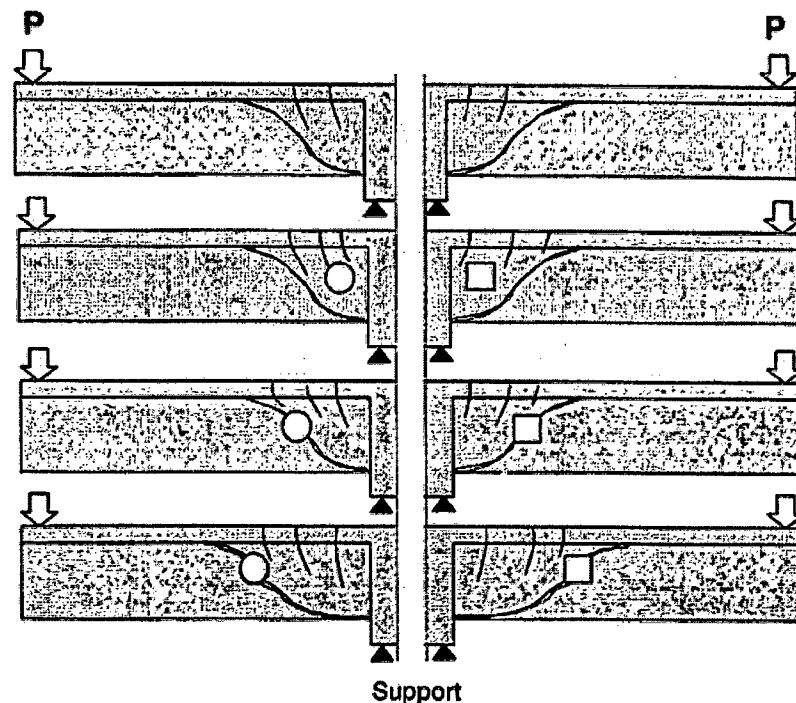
Typical shear failure of a beam without shear reinforcement (Mansur, 1998).
